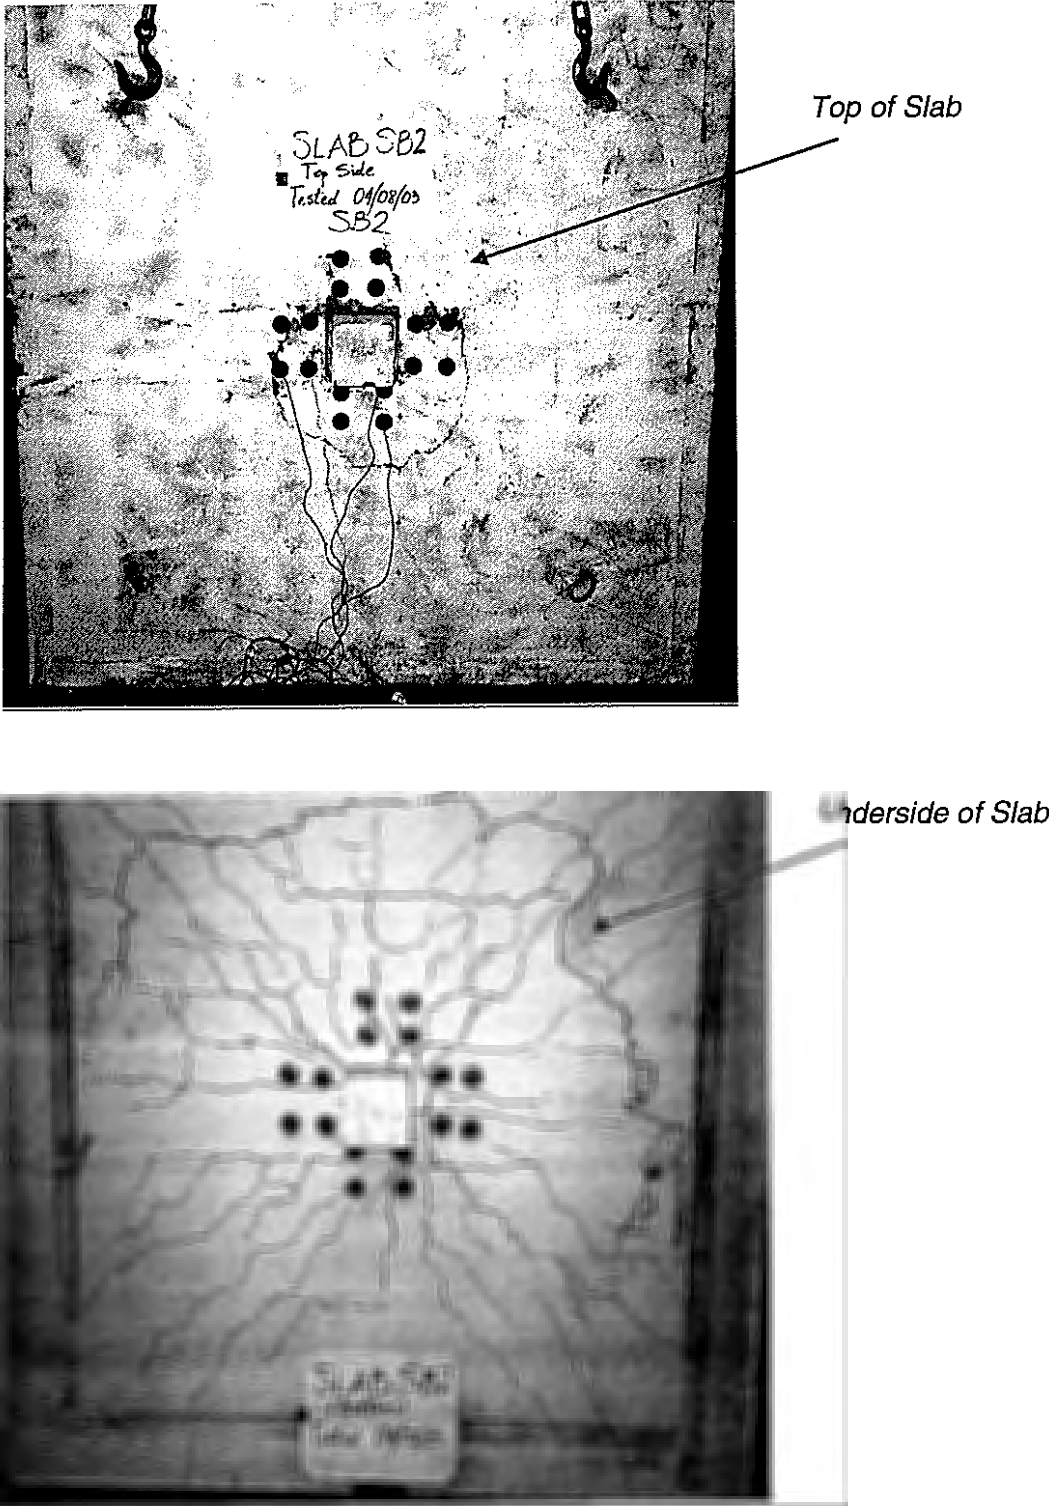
Crack Patterns after Failure of Specimen SB2
